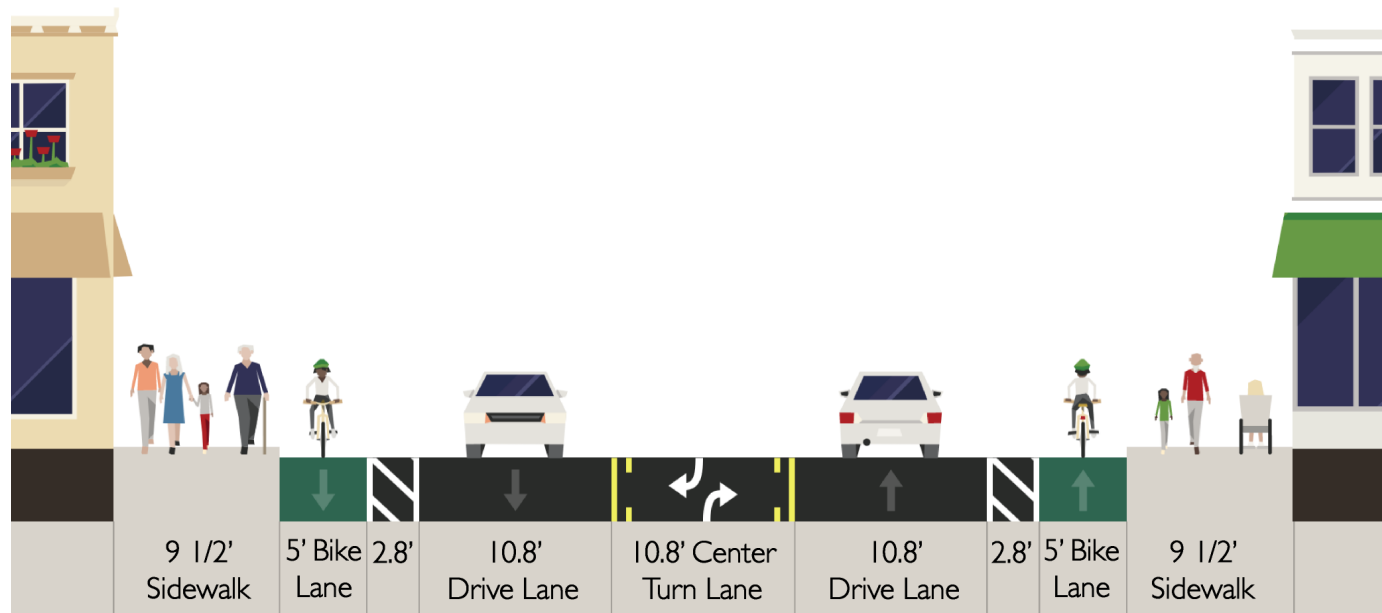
Highway 12 Cross Section A (Center Lane, No Parking)
